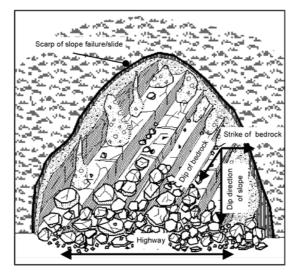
Typical Slope Failure in between CH 22 – 22+500
